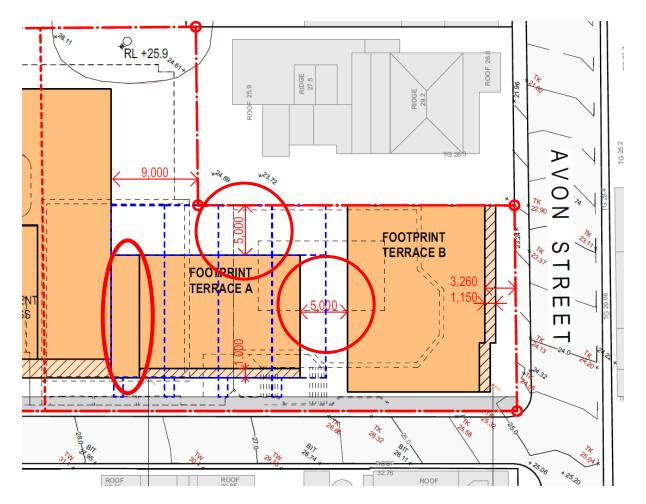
Proposed terrace building envelope demonstrating 5 metre separation between the terraces within the site and to the northern boundary (circled in red), and a separation of 3 metres between the terraces at the residential flat building (circled in red)
